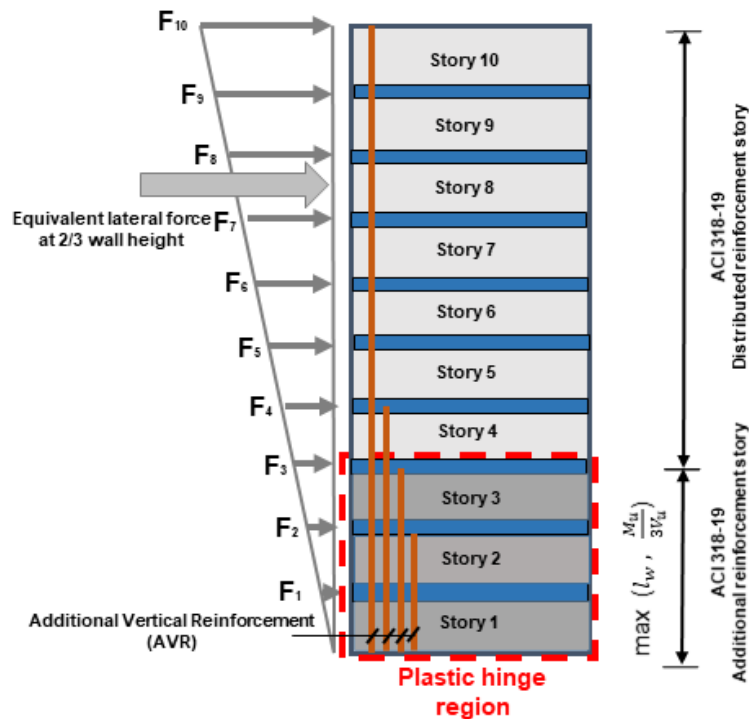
Loading protocol for a 10-storey wall designed by ACI 318-19
